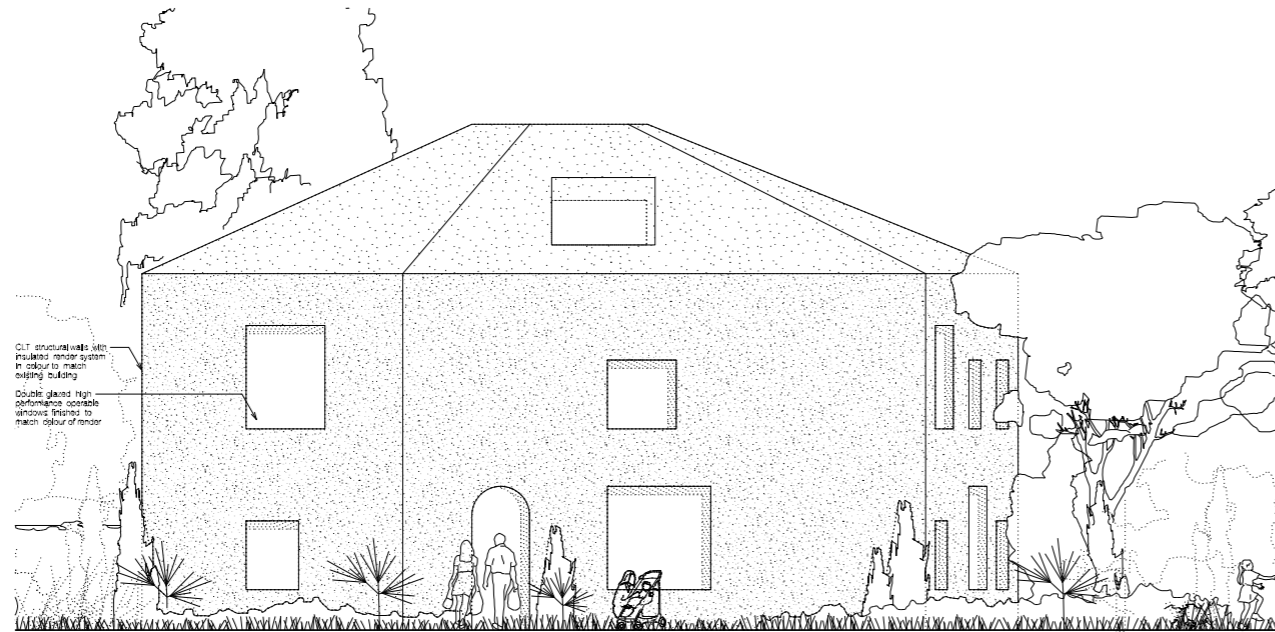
(L) Pre-application south facing Fortnam Close elevation.
